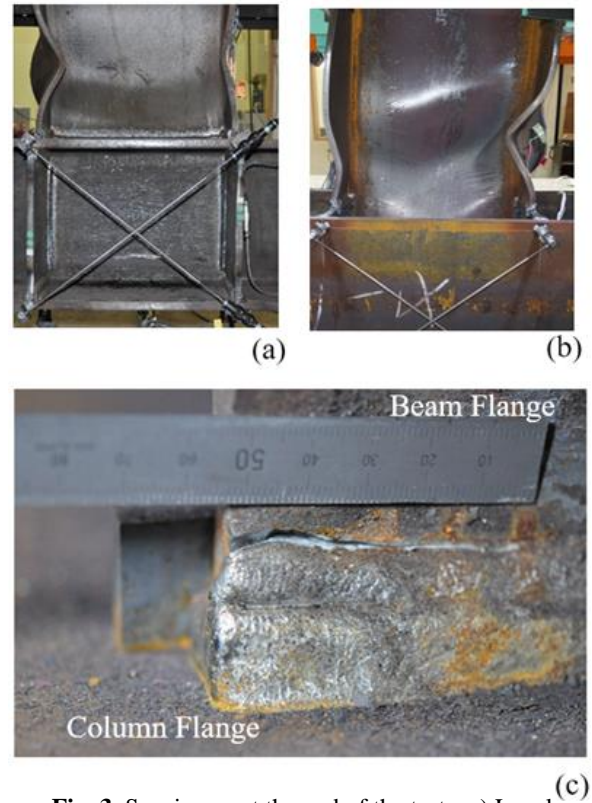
Specimens at the end of the tests: a) Local buckling of F1; b) Local buckling of W3, and c) Crack at the groove weld termination of F2.
